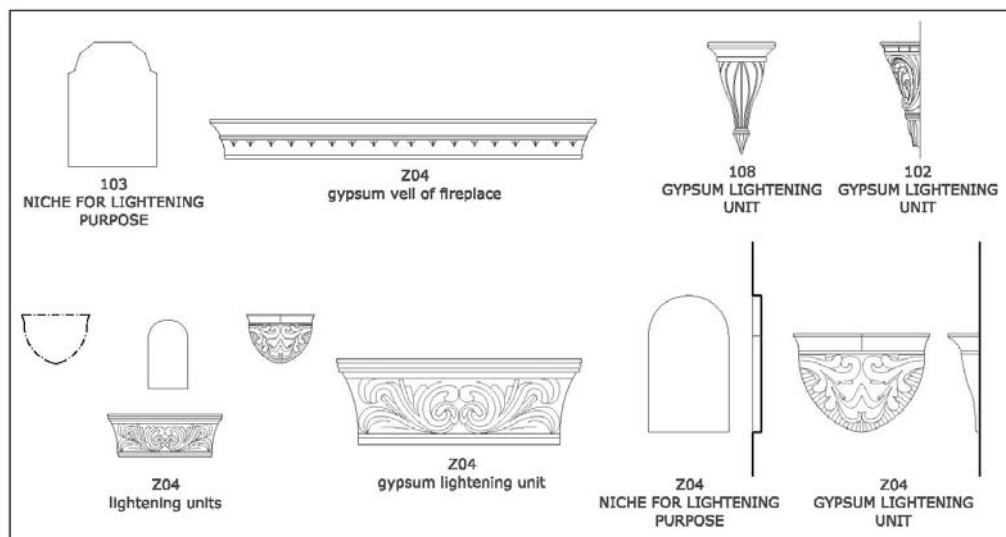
Types and Details of Gypsum Lightening Units, Scale: 1/20 (Presented in 1/5 at Jury)
